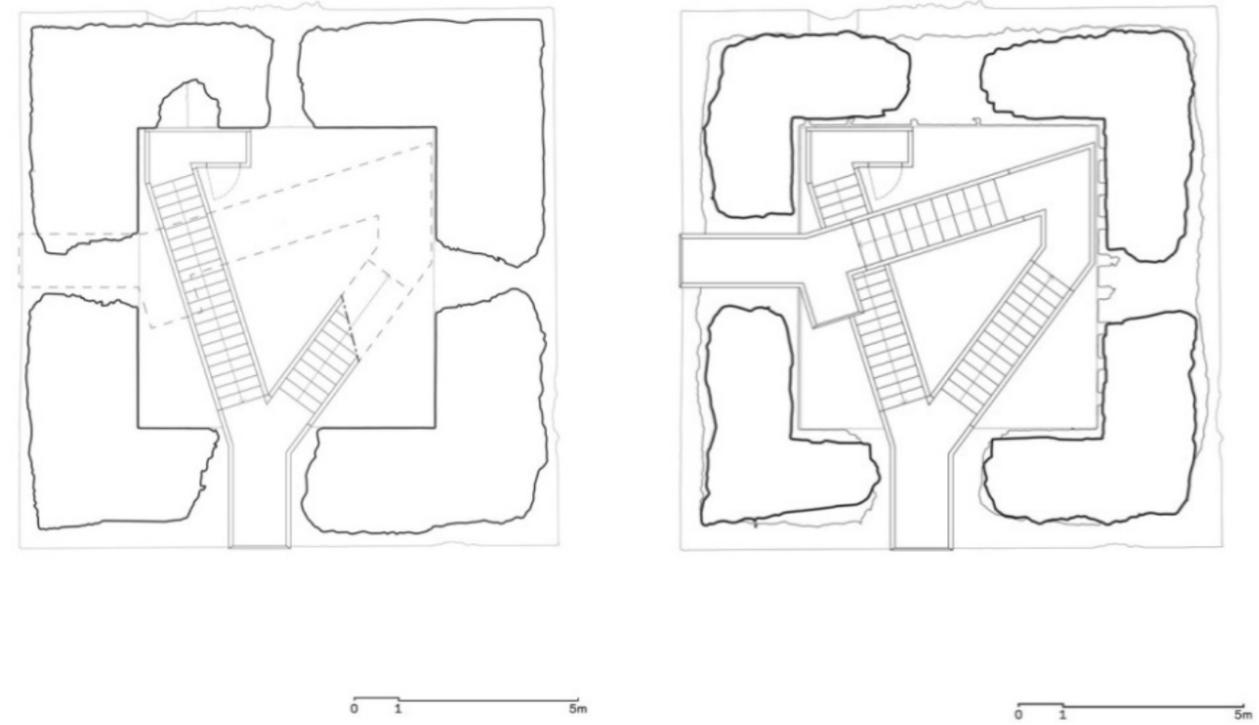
Ground floor plan (left), first floor plan (right) (Source: Castro, 2019)
